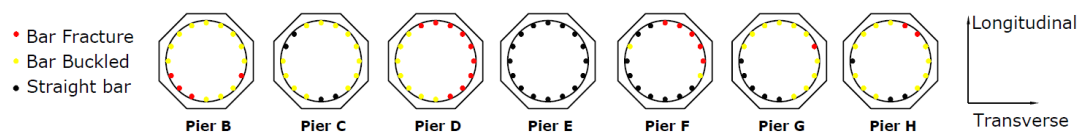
Damage to individual reinforcement bars and indicates which piers exhibited the worst damage.
